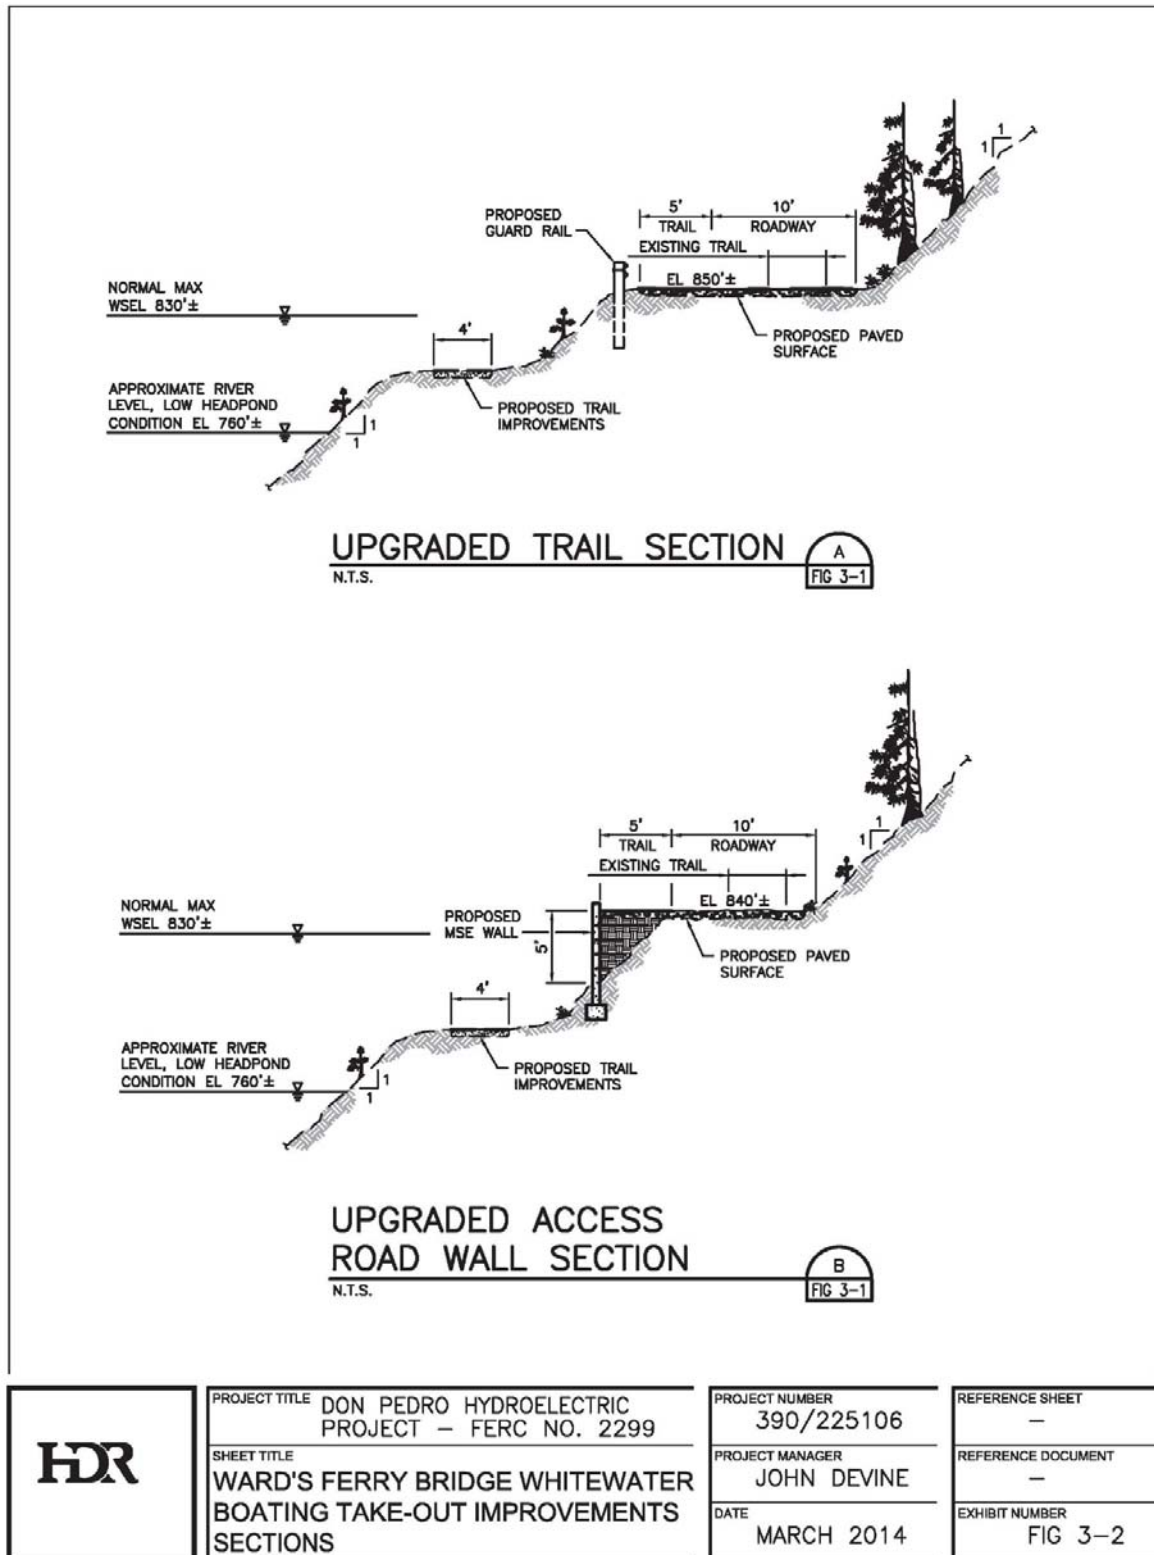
Ward's Ferry Bridge whitewater boating take-out improvements -- sections.
